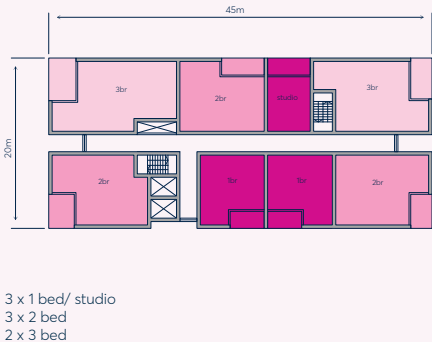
Typical Parramatta DCP & HDA floorplates diagram.
